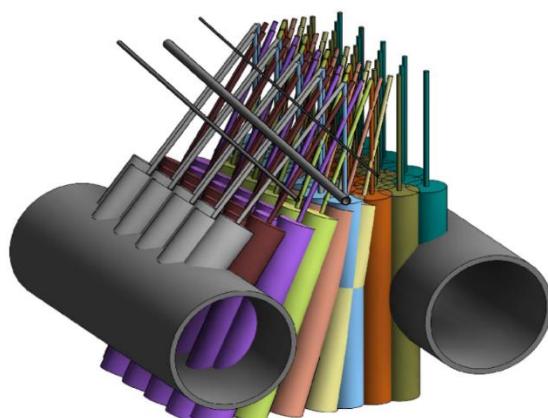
Soil improvement from the surface in mechanised tunnelling (courtesy Geodata).
